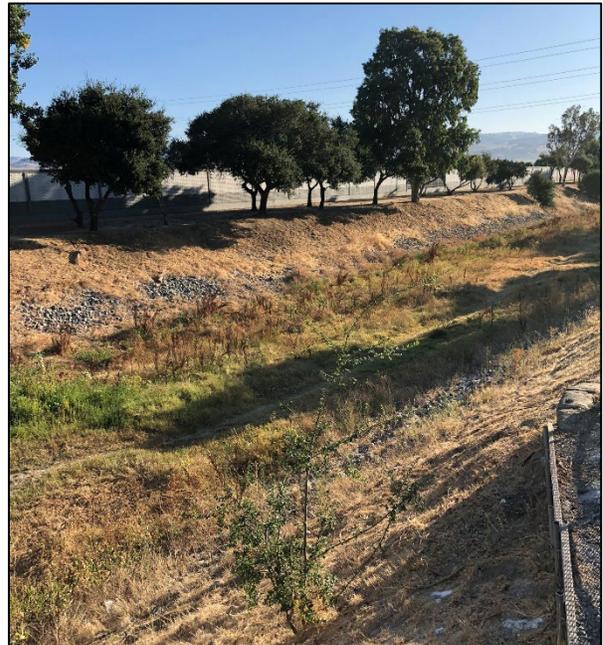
Miller Slough crossing on Leavesley Avenue, showing vegetation in channel.
